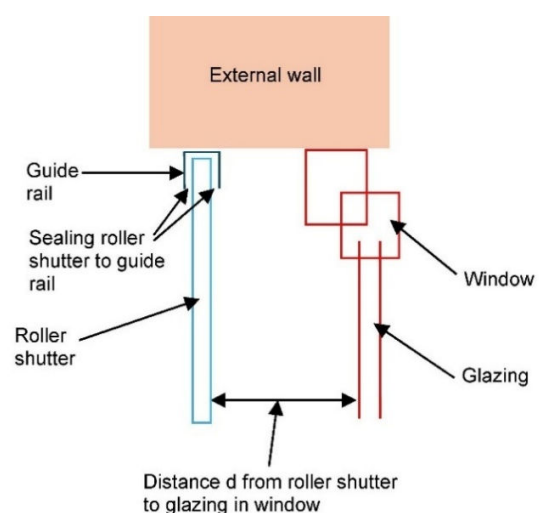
Schematic drawing (horizontal section) of onsite joint configuration for window and roller shutter to external wall in building project
